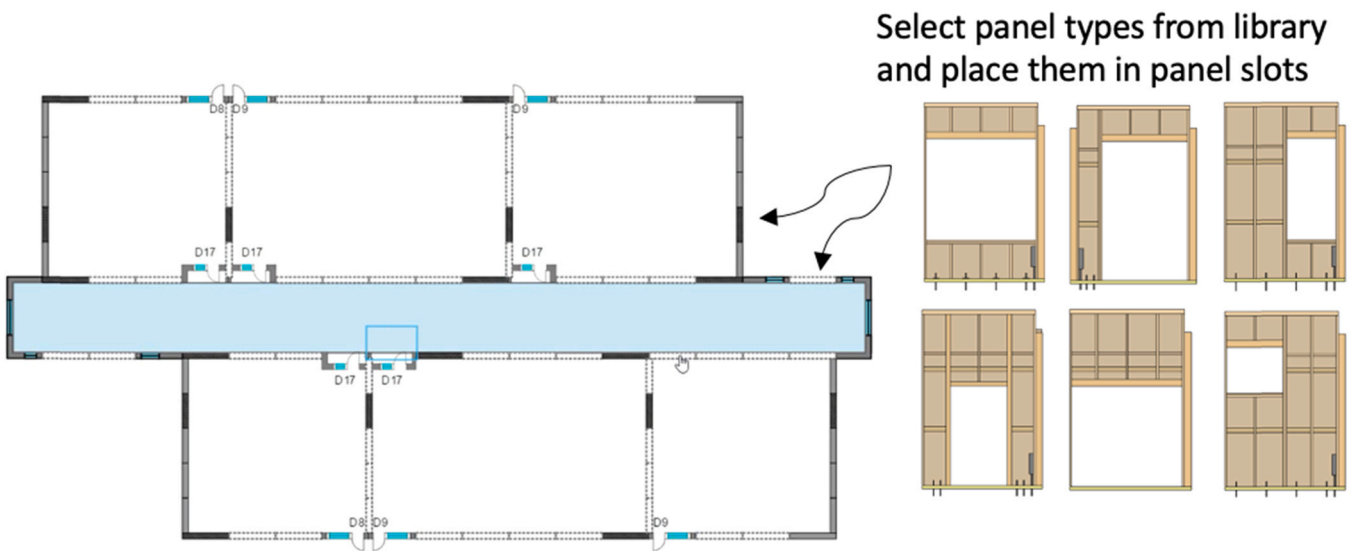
Example of a technical configurator for timber-panelized buildings.
